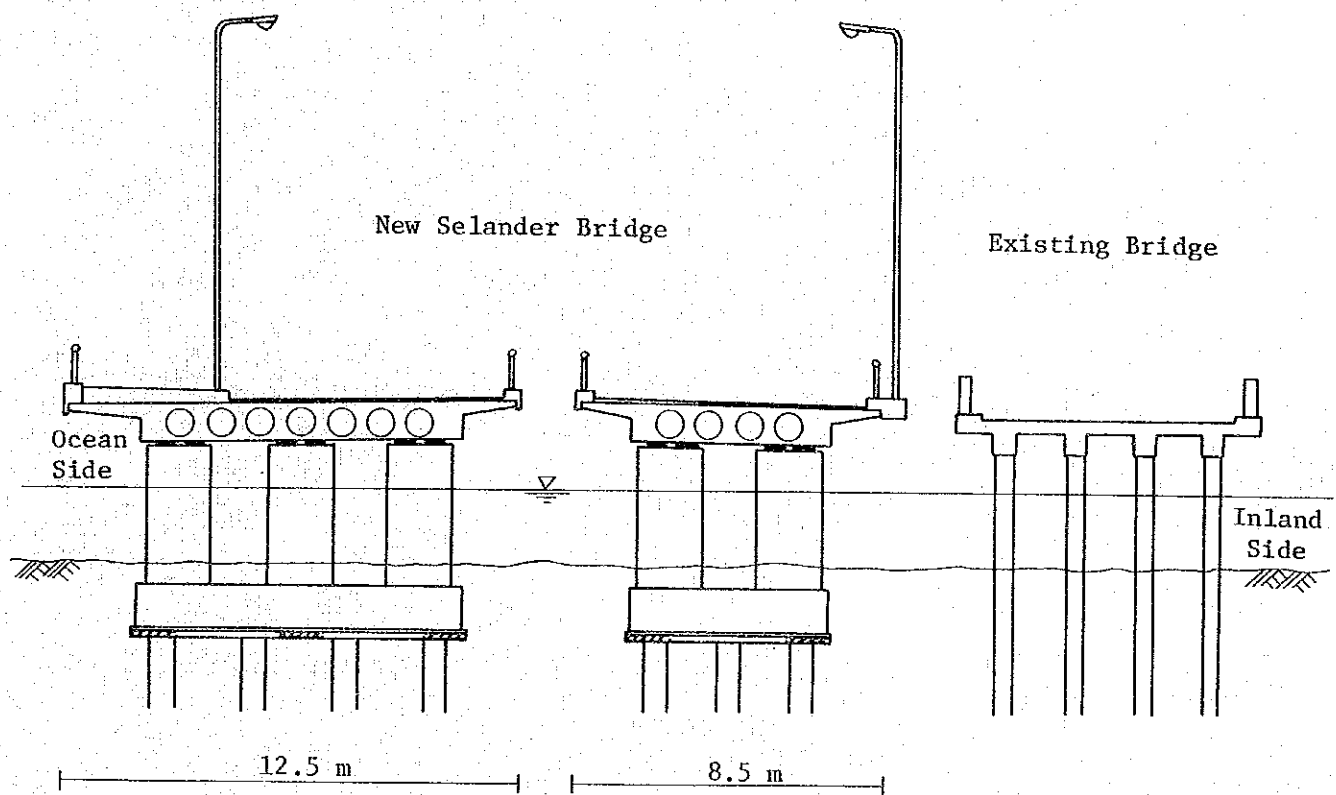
Cross Sectional View of Planned and Existing Selander Bridge
